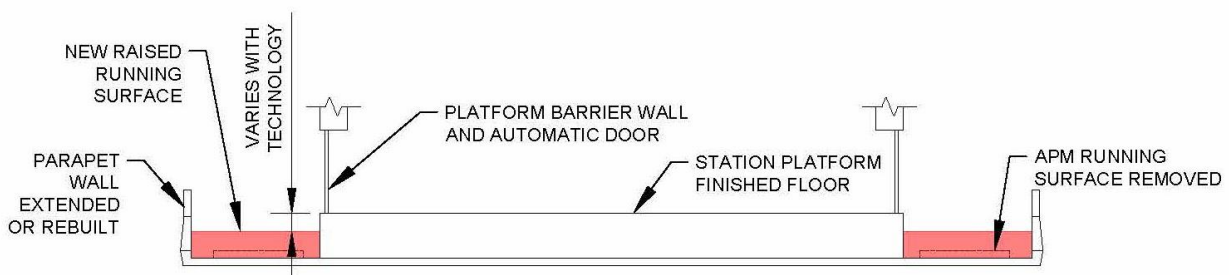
Potential AV Guideway Cross-Section at Stations
